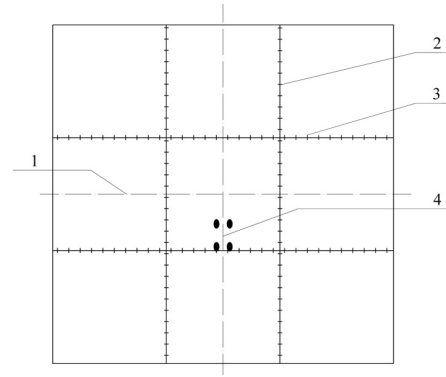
Nine-slab jointed rigid pavement model: 1 – Portland cement concrete slab; 2 – longitudinal joint with aggregate interlock or tie bars; 3 – transverse joint with dowel bars; 4 – wheel loading (aircraft main landing gear)
